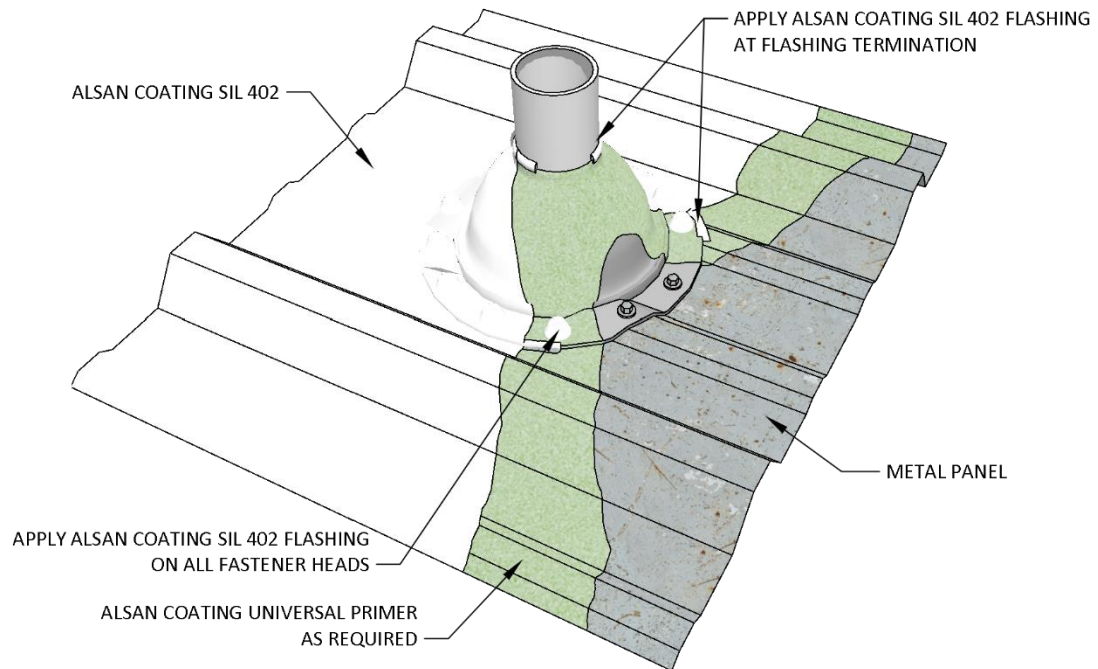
Silicone Roof Coating Over Metal Lap Panels, Penetration
